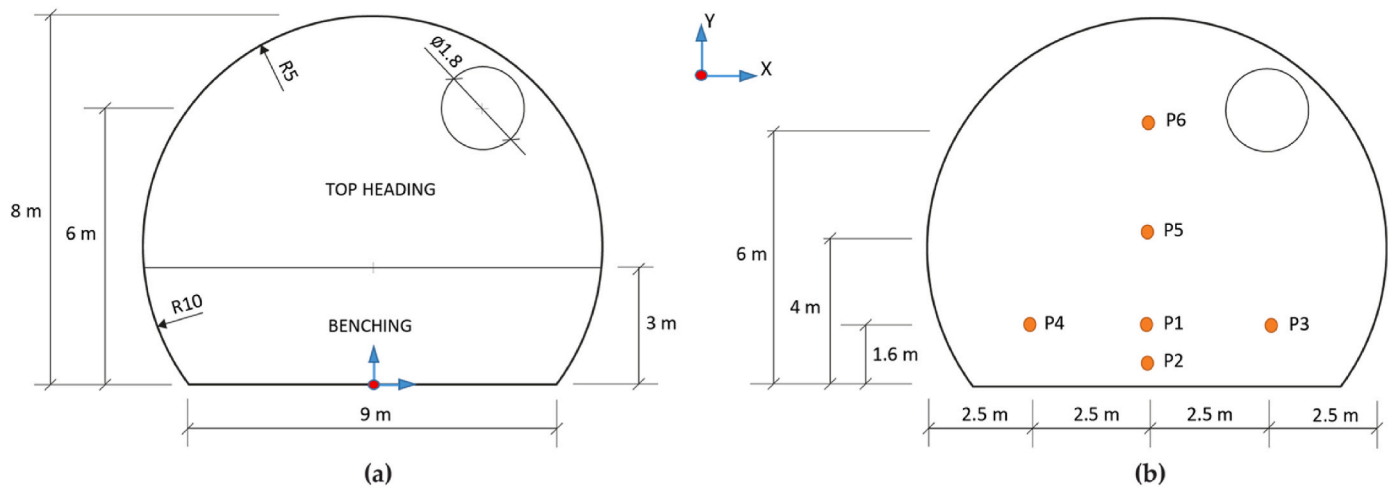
Cross-section of the tunnel. (a) Top heading, benching and ventilation duct; (b) Location of observation points in the full face of the tunnel.
